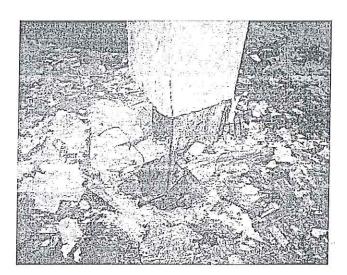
View of the concrete and steel structure at the Nelson House Annex. This probe was probably opened as part of a prior study of the building.
